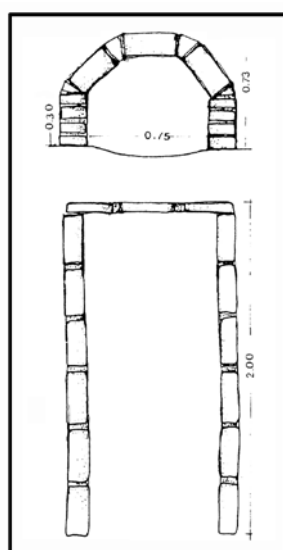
Burial № 1 at V. Kolarof str., plan and cross-section.
